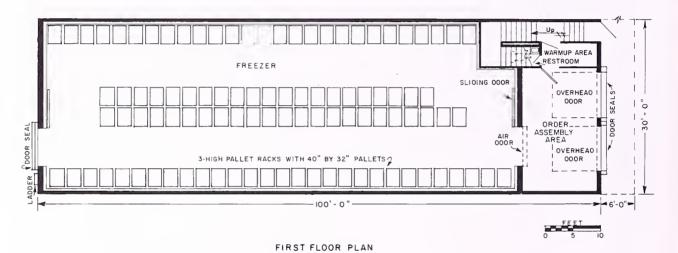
Layout of a frozen food firm in a multiple-occupancy building unit.
